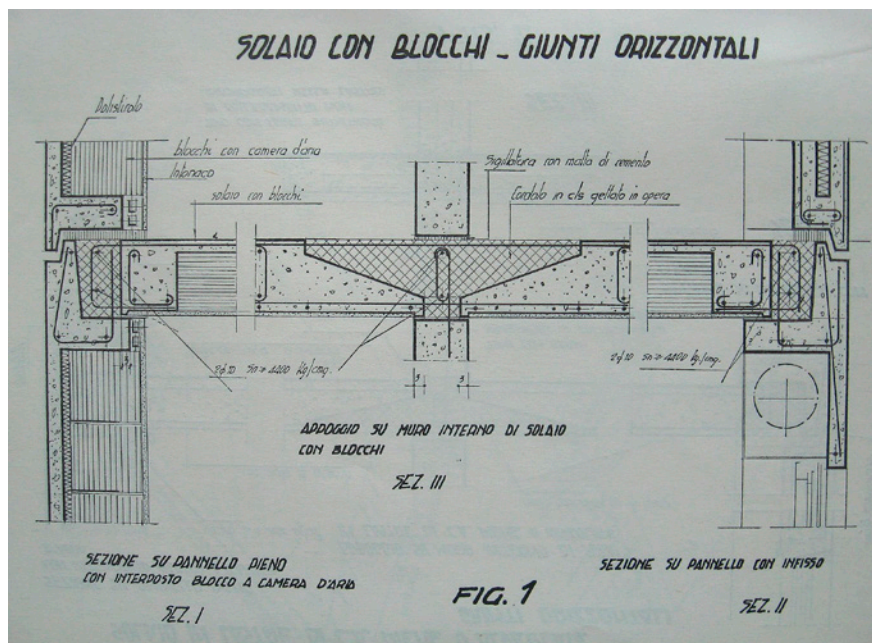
Baretts system detail of slab section with horizontal joint blocks. Source: ATC archive, Turin, 1963-66.
